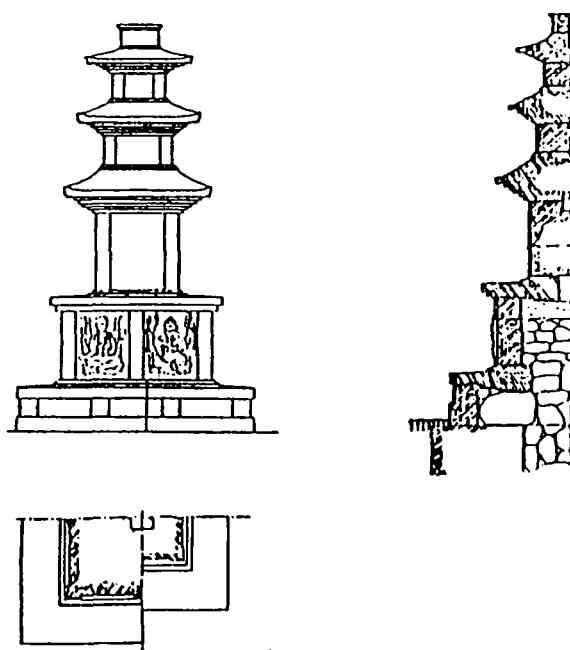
Two partial plans, elevation, partial section of the western stone pagoda at Nam-san-dong
